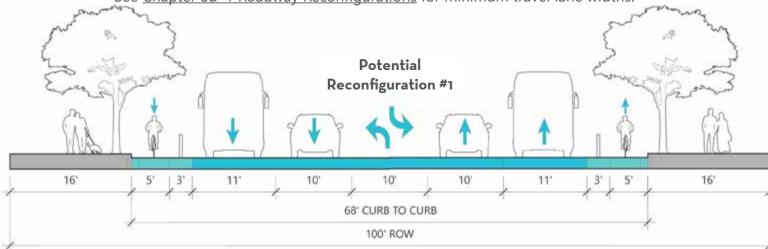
Potential Reconfiguration #1: One-Way, In-Street, Class IV Bikeway on an Arterial Street.
